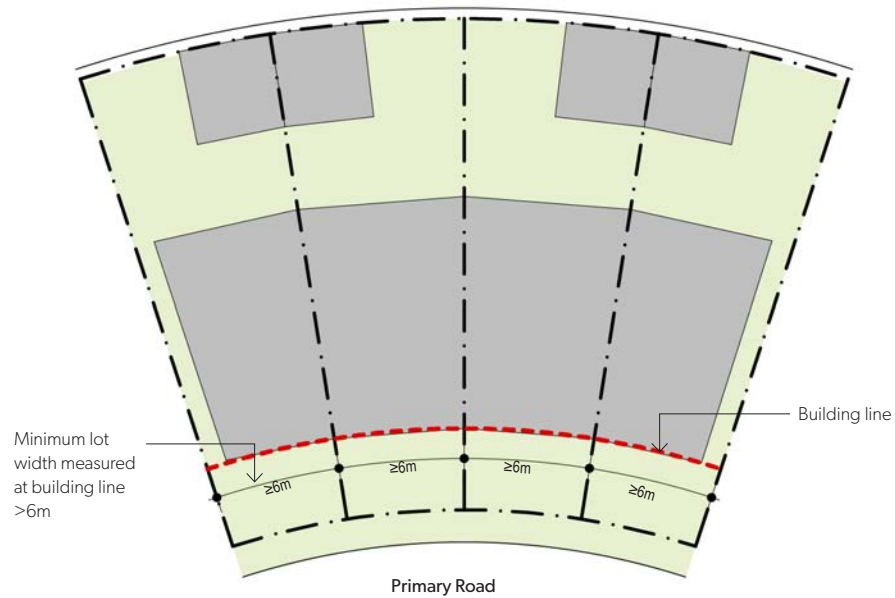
Street frontage width is measured at the building line for multi dwelling housing (terraces)
